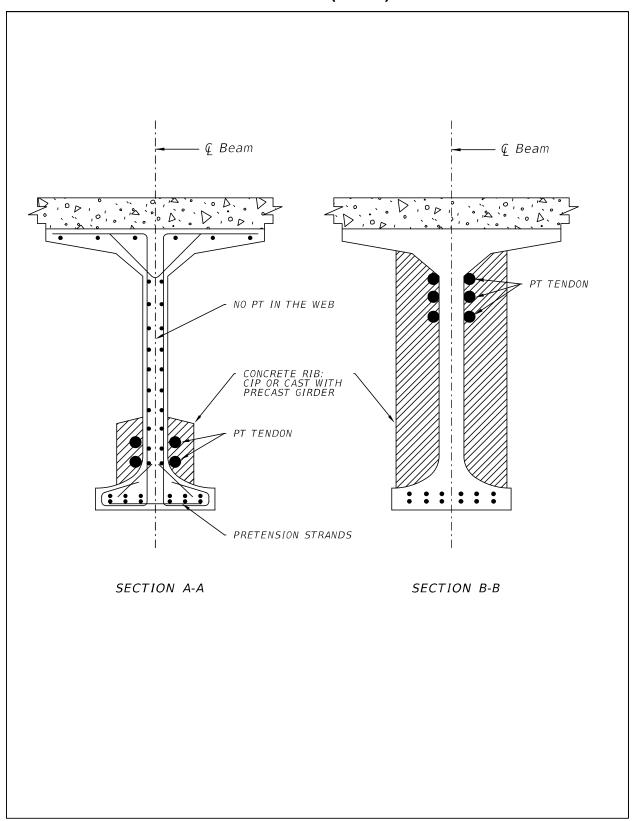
Post-Tensioned Spliced Girder Details - Tendons External to the Web (2 of 2)
